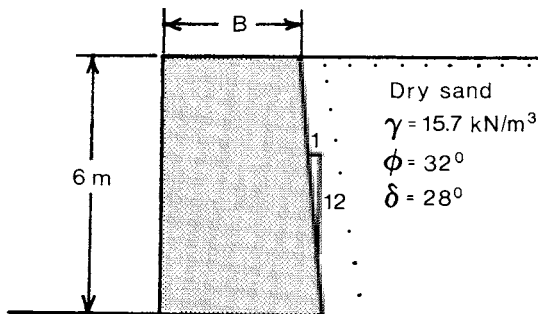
Gravity retaining wall in Problem 6.7.
